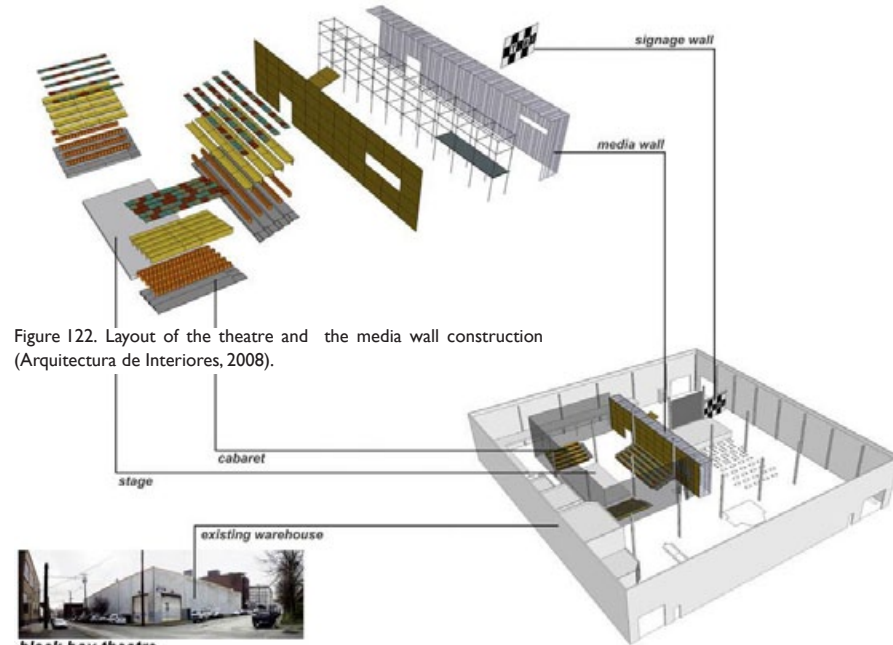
Layout of the theatre and the media wall construction (Arquitectura de Interiores, 2008).
